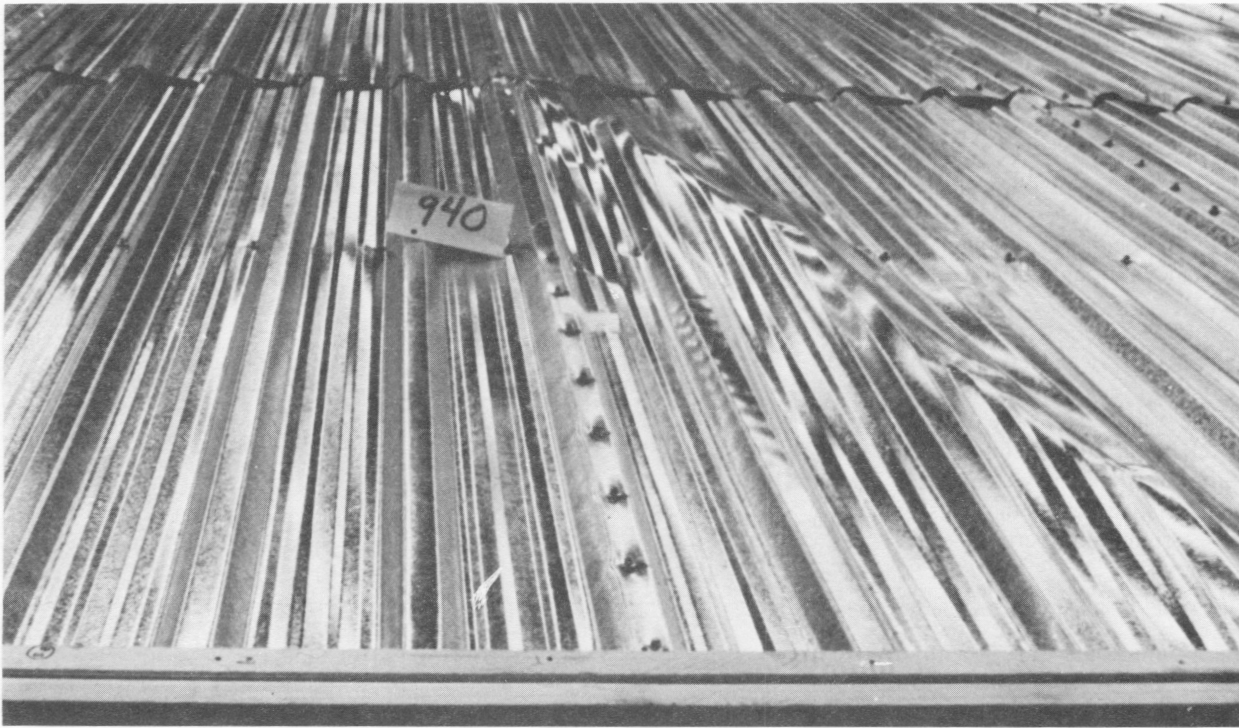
Screwed sheet steel diaphragm after onset of buckling failure at the end zone.
